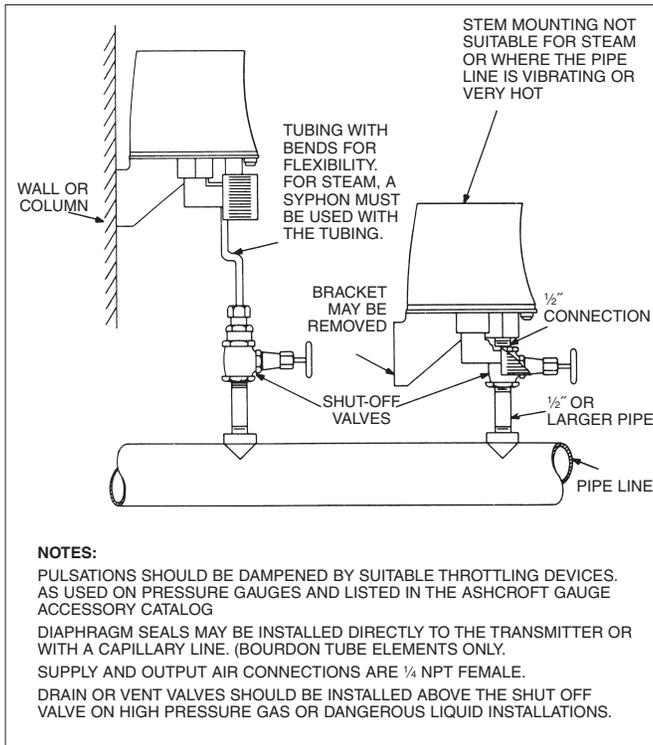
Wall and Stem-Mounted Pressure Transmitter Installation
